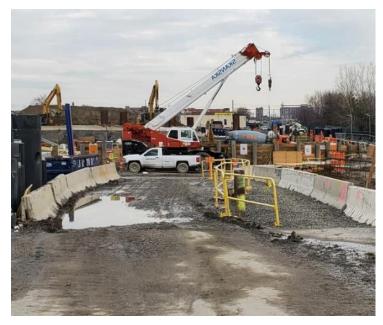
CM trailer area south of eastern 2.5 acre BUD area looking North
